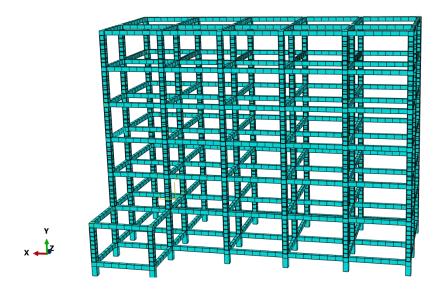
Sample meshing view of Steel strap jacketed RC frame
